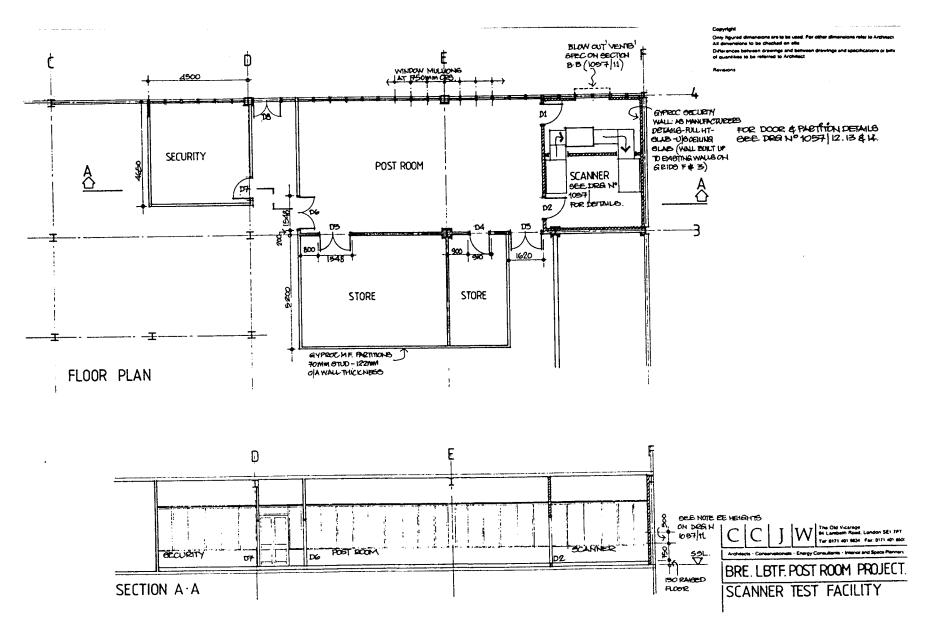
Plan of complete mail room facilities showing location of the scanner room.
